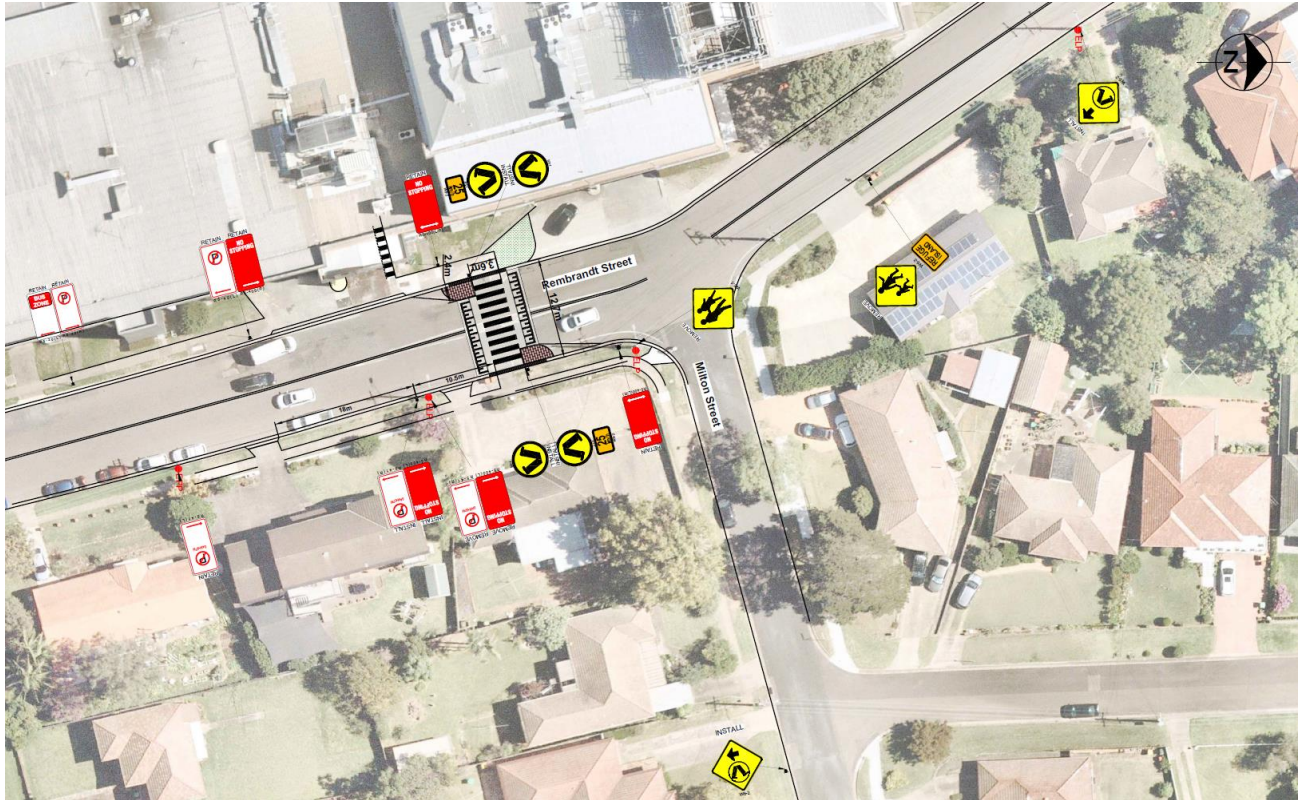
Concept plan of the proposed raised pedestrian crossing in Rembrandt Street south of Milton Street, Carlingford
